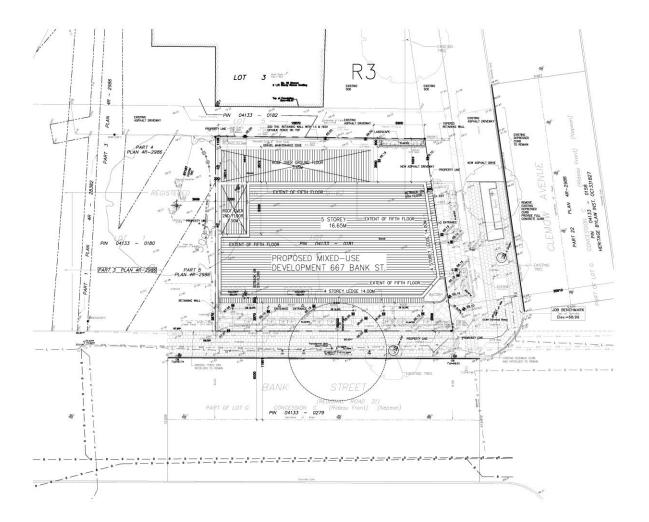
Site plan of the proposed development. Credit: Vincent P. Colizza Architect Inc. 2017
